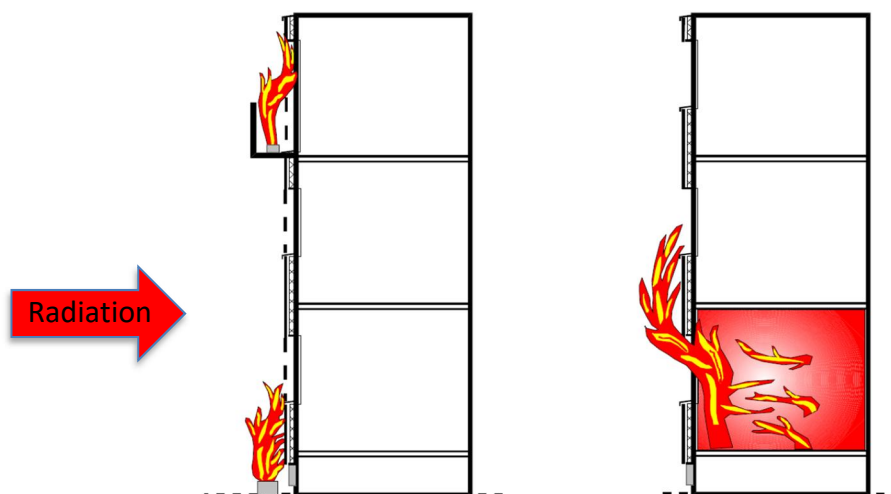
Typical fire scenarios for facades: Fire in a building located next to the façade, fire outside the building in front of the façade or fire inside the building with a flashover [1].
